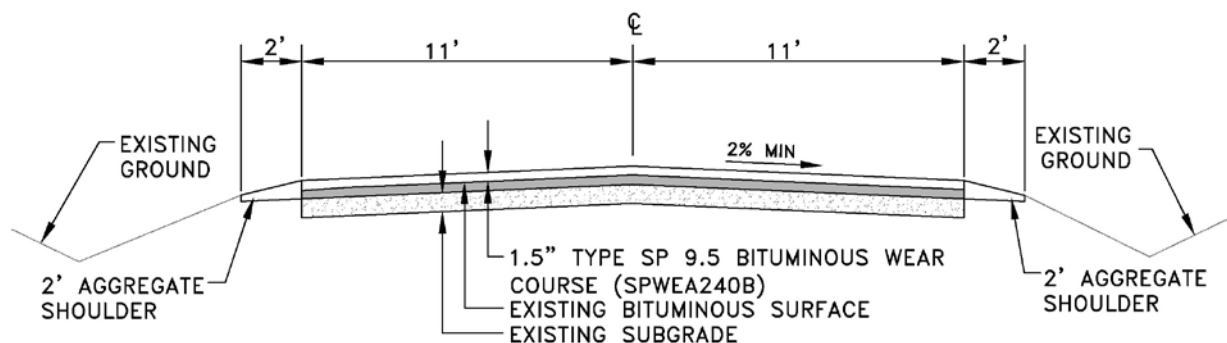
Residential Overlay – Bituminous Overlay Typical Section
